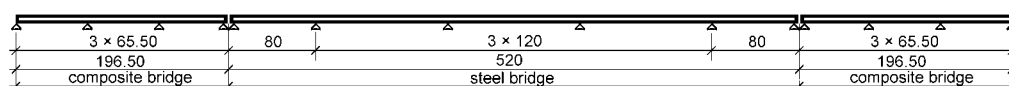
Span arrangement of the Danube bridge at Szekszárd.
